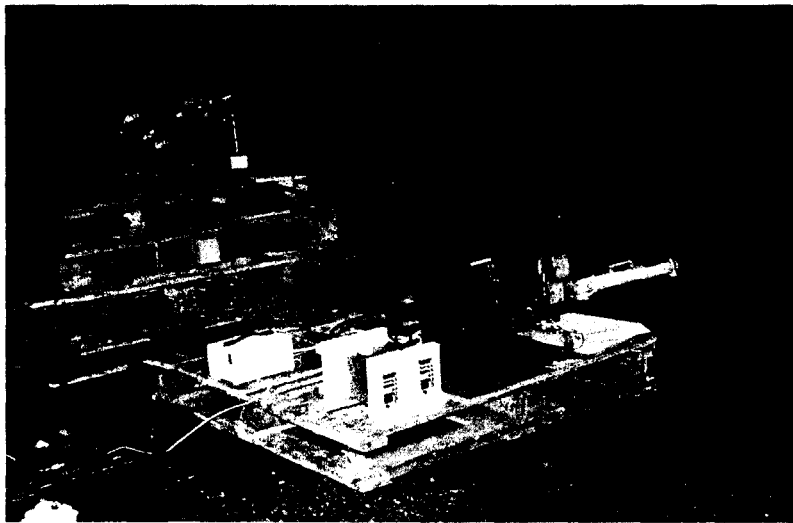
Pullout test of Swellex bolt at tunnel Site
